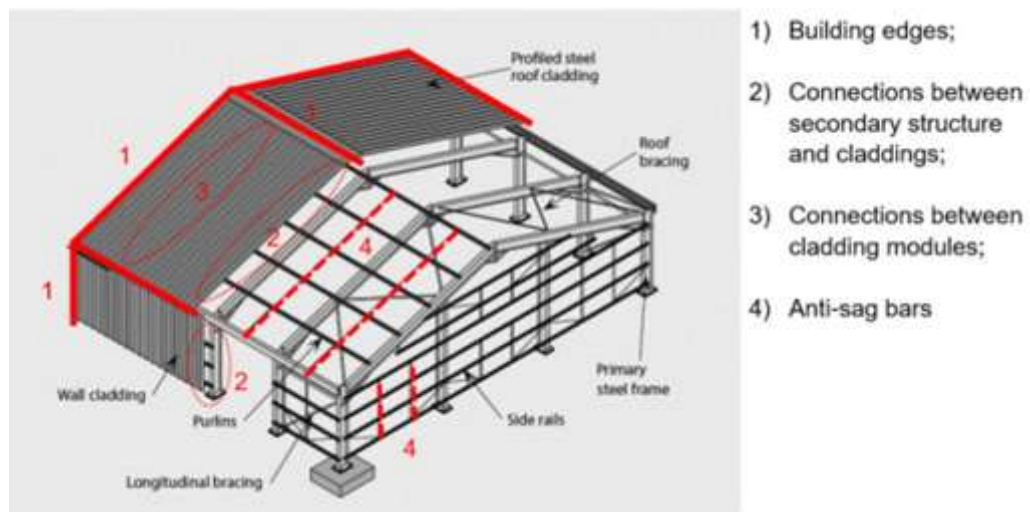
Cladding elements as the critical building layer for deconstruction
